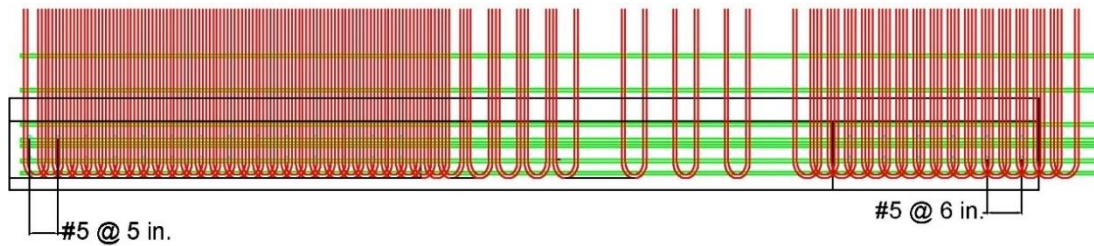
Option 3, Interior Post Deck Reinforcement, Plan and Elevation Views
